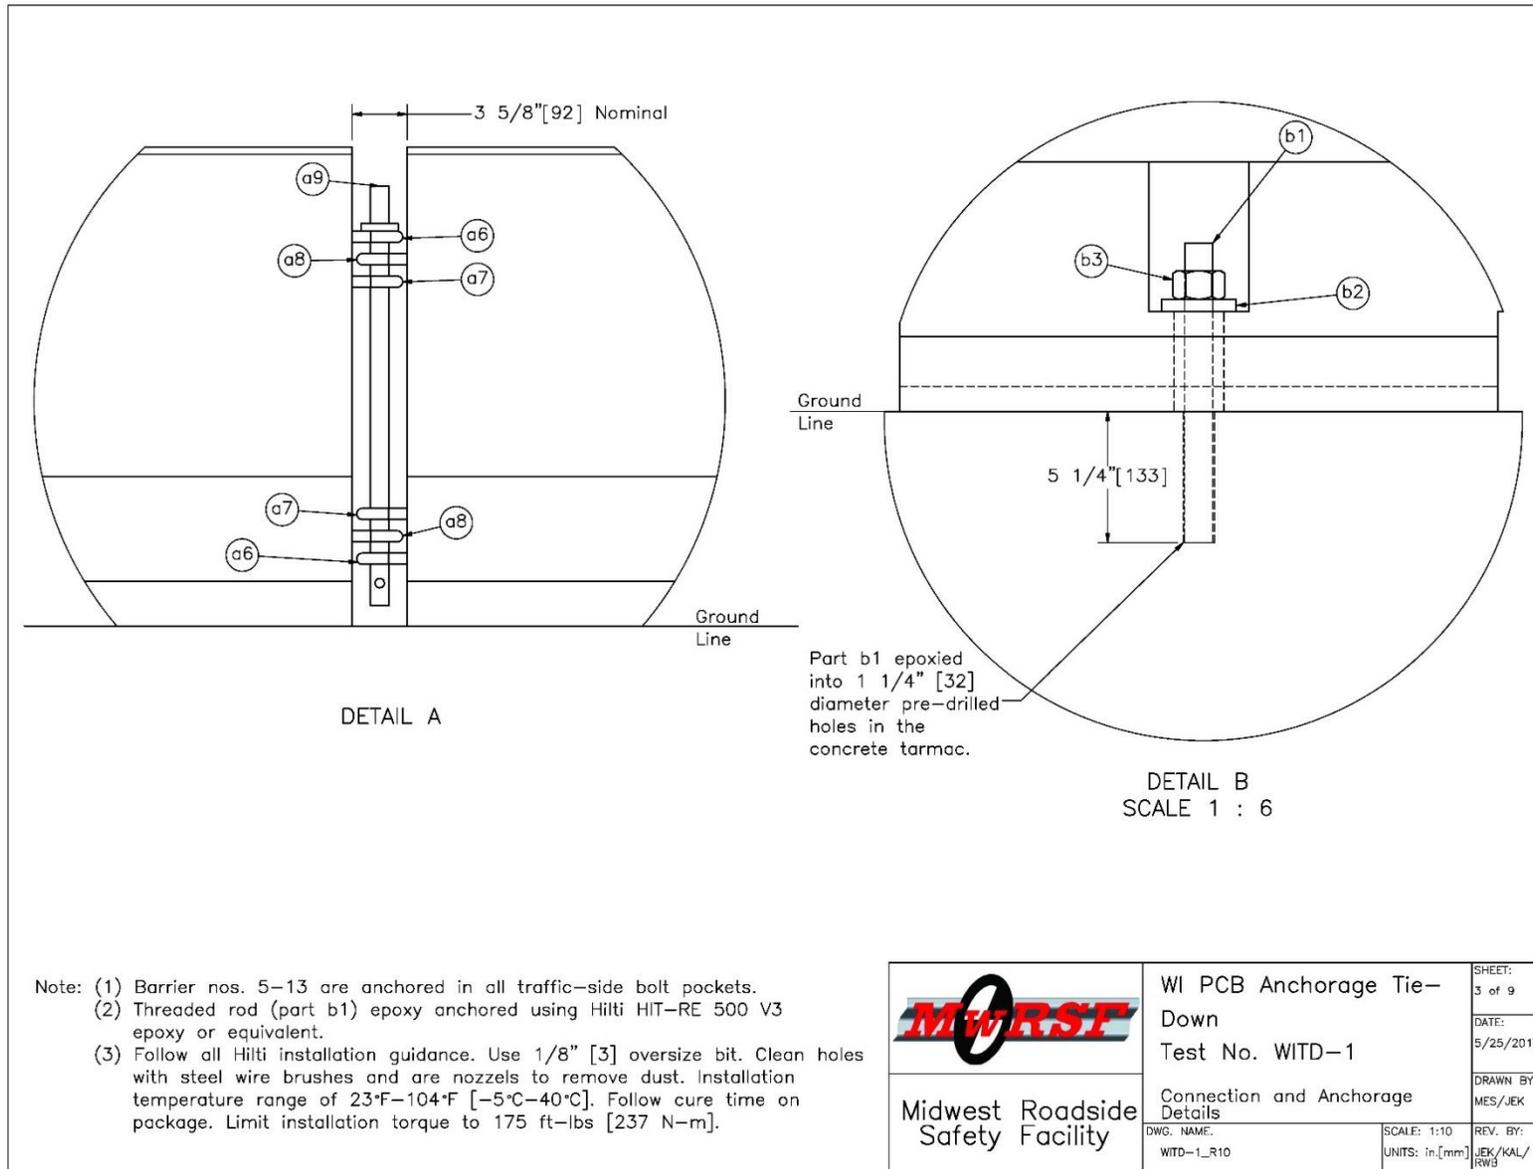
Connection and Anchorage Details, Test No. WITD-1
